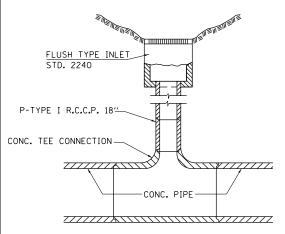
DETAILS: CONCRETE COLLLAR ELLIPTICAL PIPE, METHOD OF DRAINING PROPOSED MEDIAN INLETS, & CC&G OUTLET CALE: SHEET NO. OF SHEETS STA. TO STA.
